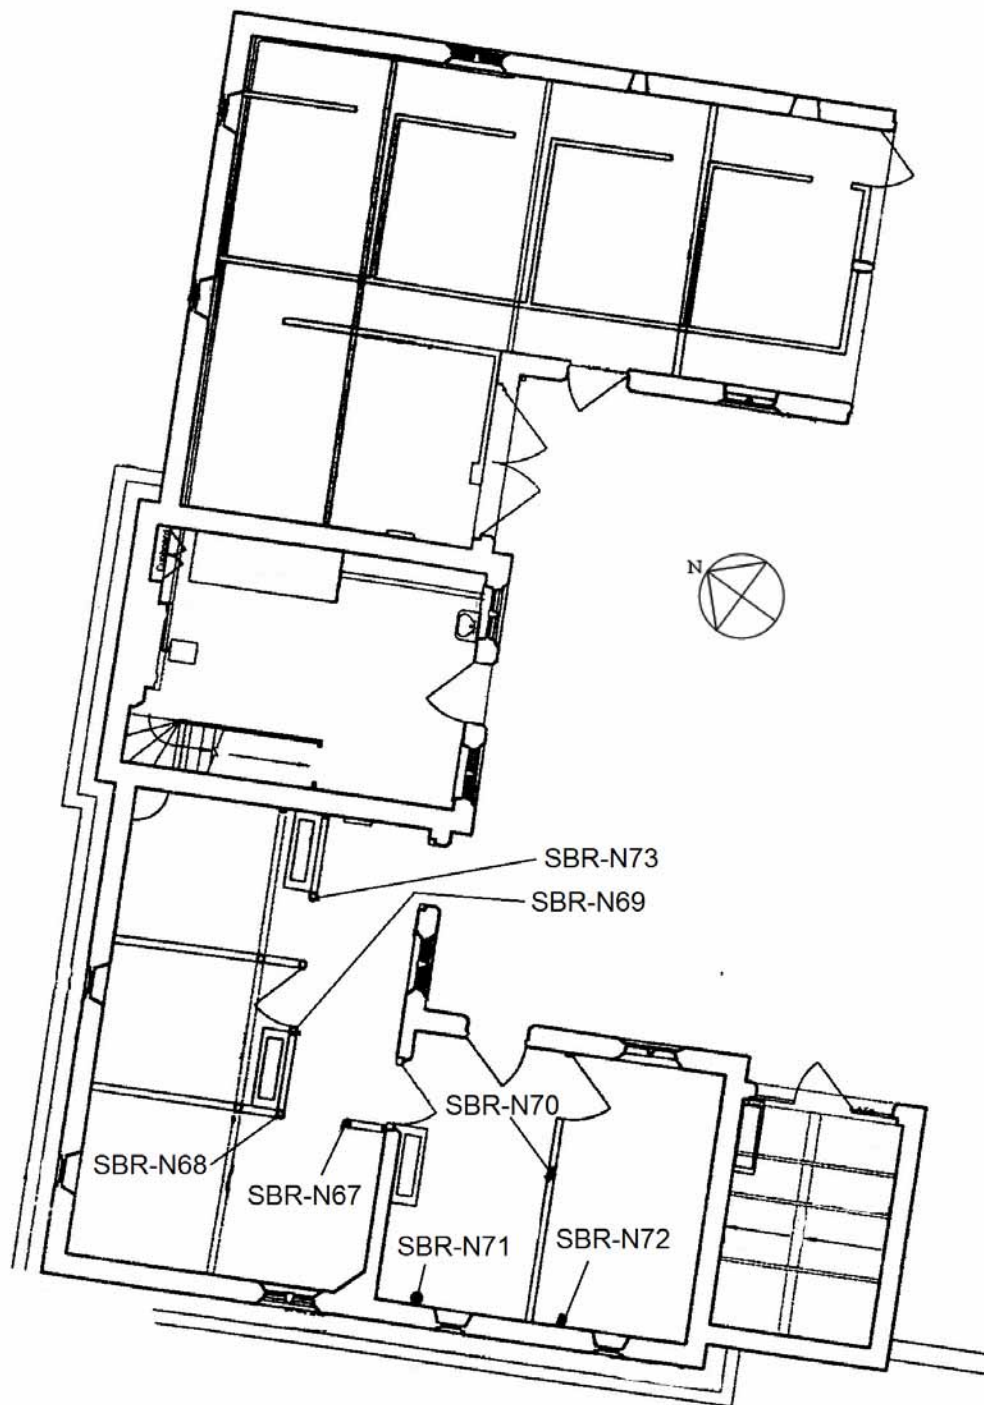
Ground-floor plan of the coach/mash houses and stables, showing the location of samples SBR-N67-73
